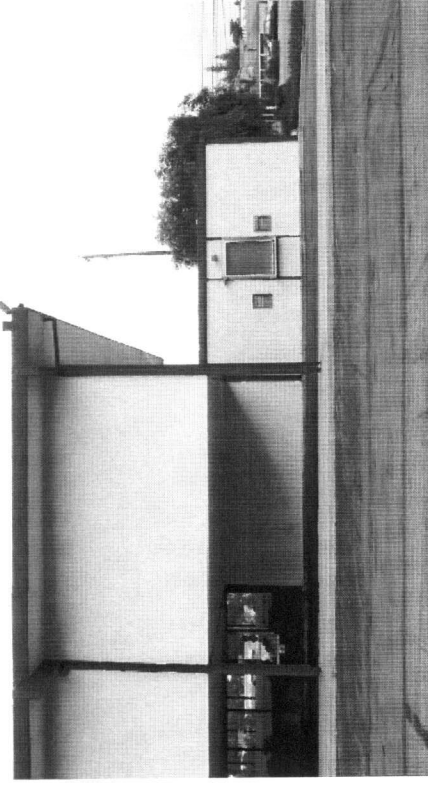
Southeast corner of Bank, Dairy Room exterior shown
